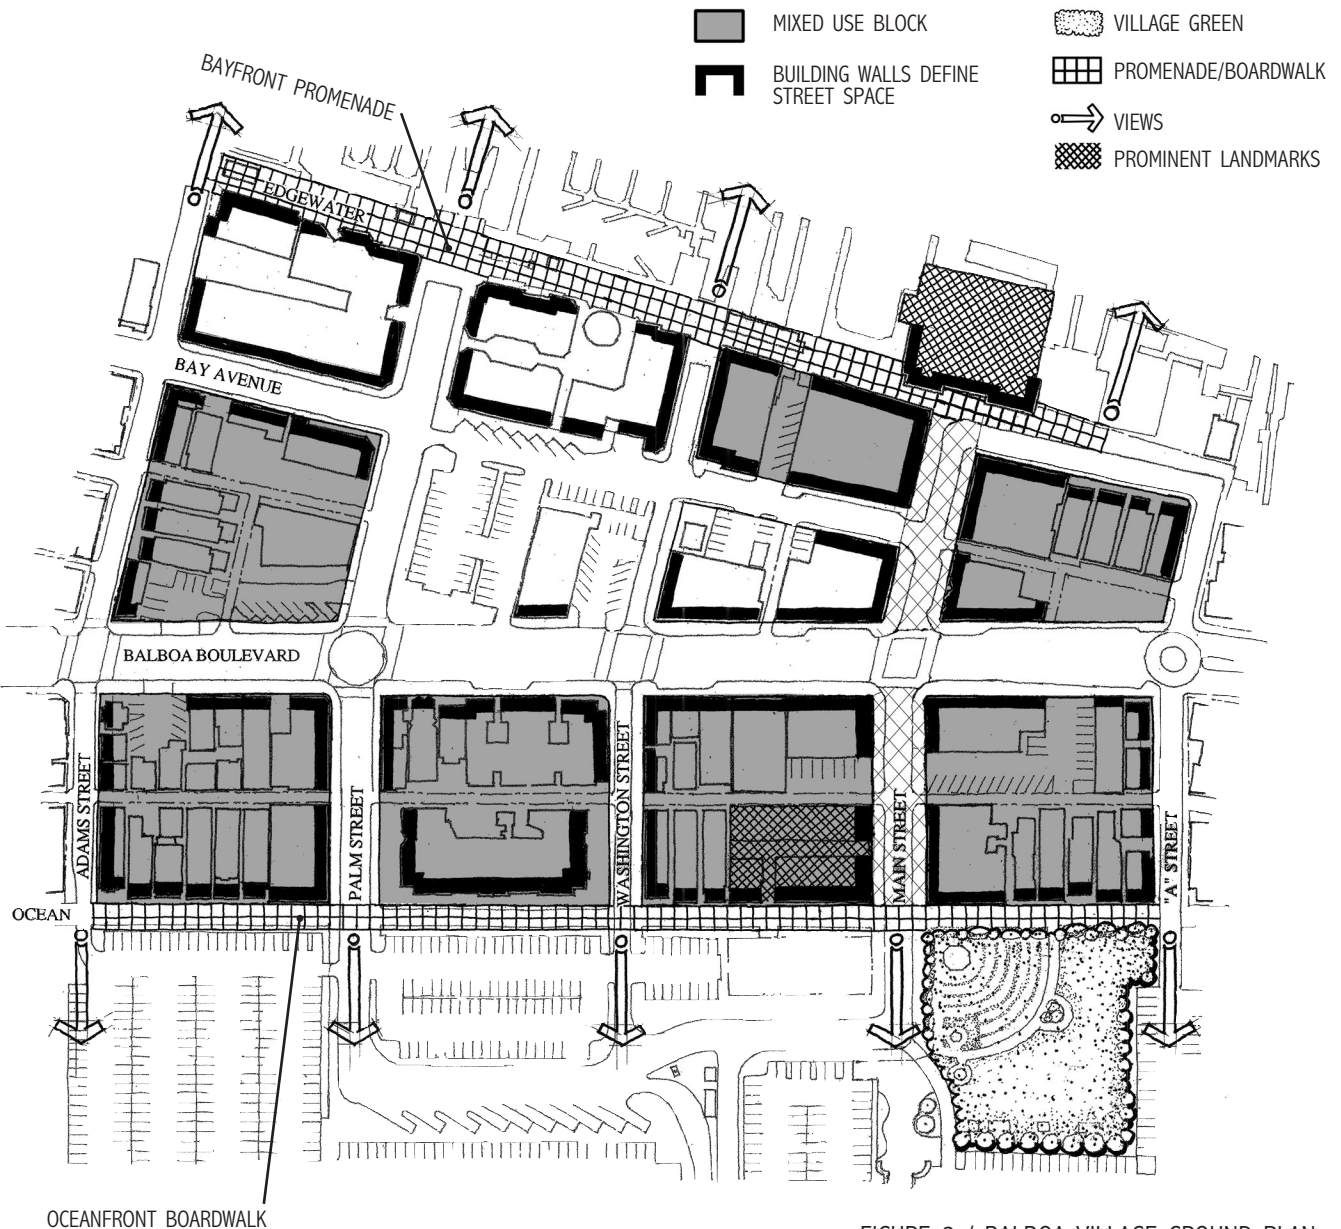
/ BALBOA VILLAGE GROUND PLAN
